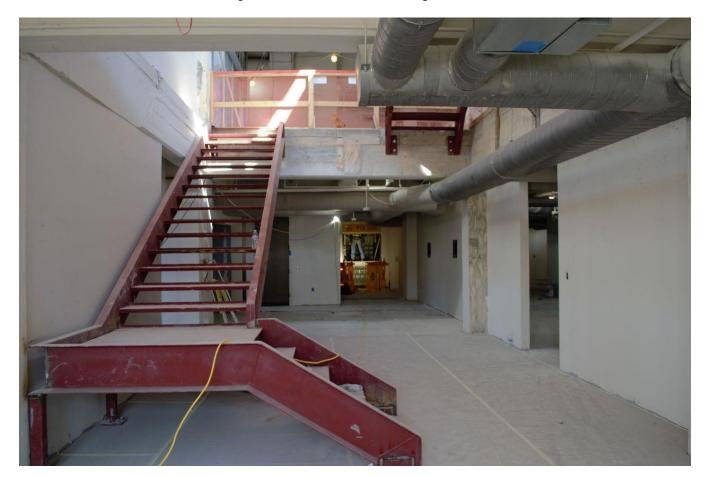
South end of basement near east elevation, showing new partition walls, looking west.
